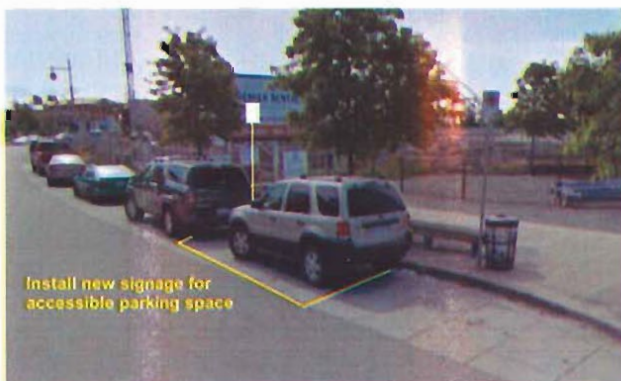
Proposed Accessible Parking Space on Bayview St east of No. 1 Road
